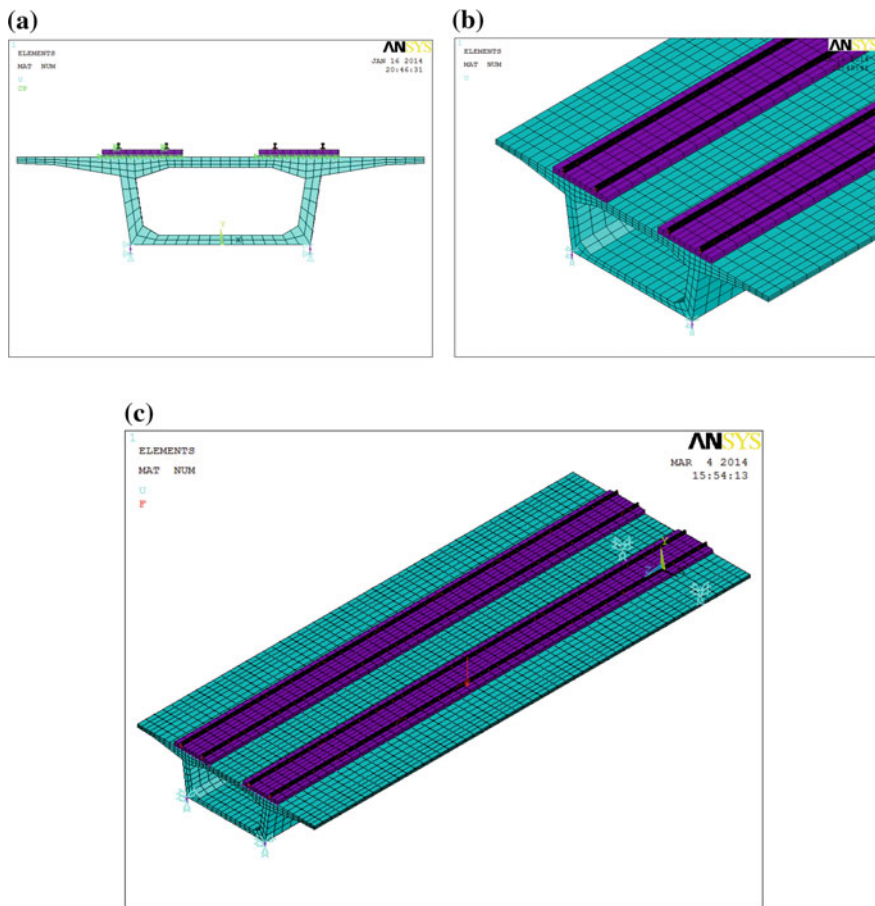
Finite element model of the elevated track-box girder coupling system. a Displacement constraint of cross section. b Partial enlarged view. c Finite element mesh of the box girder
